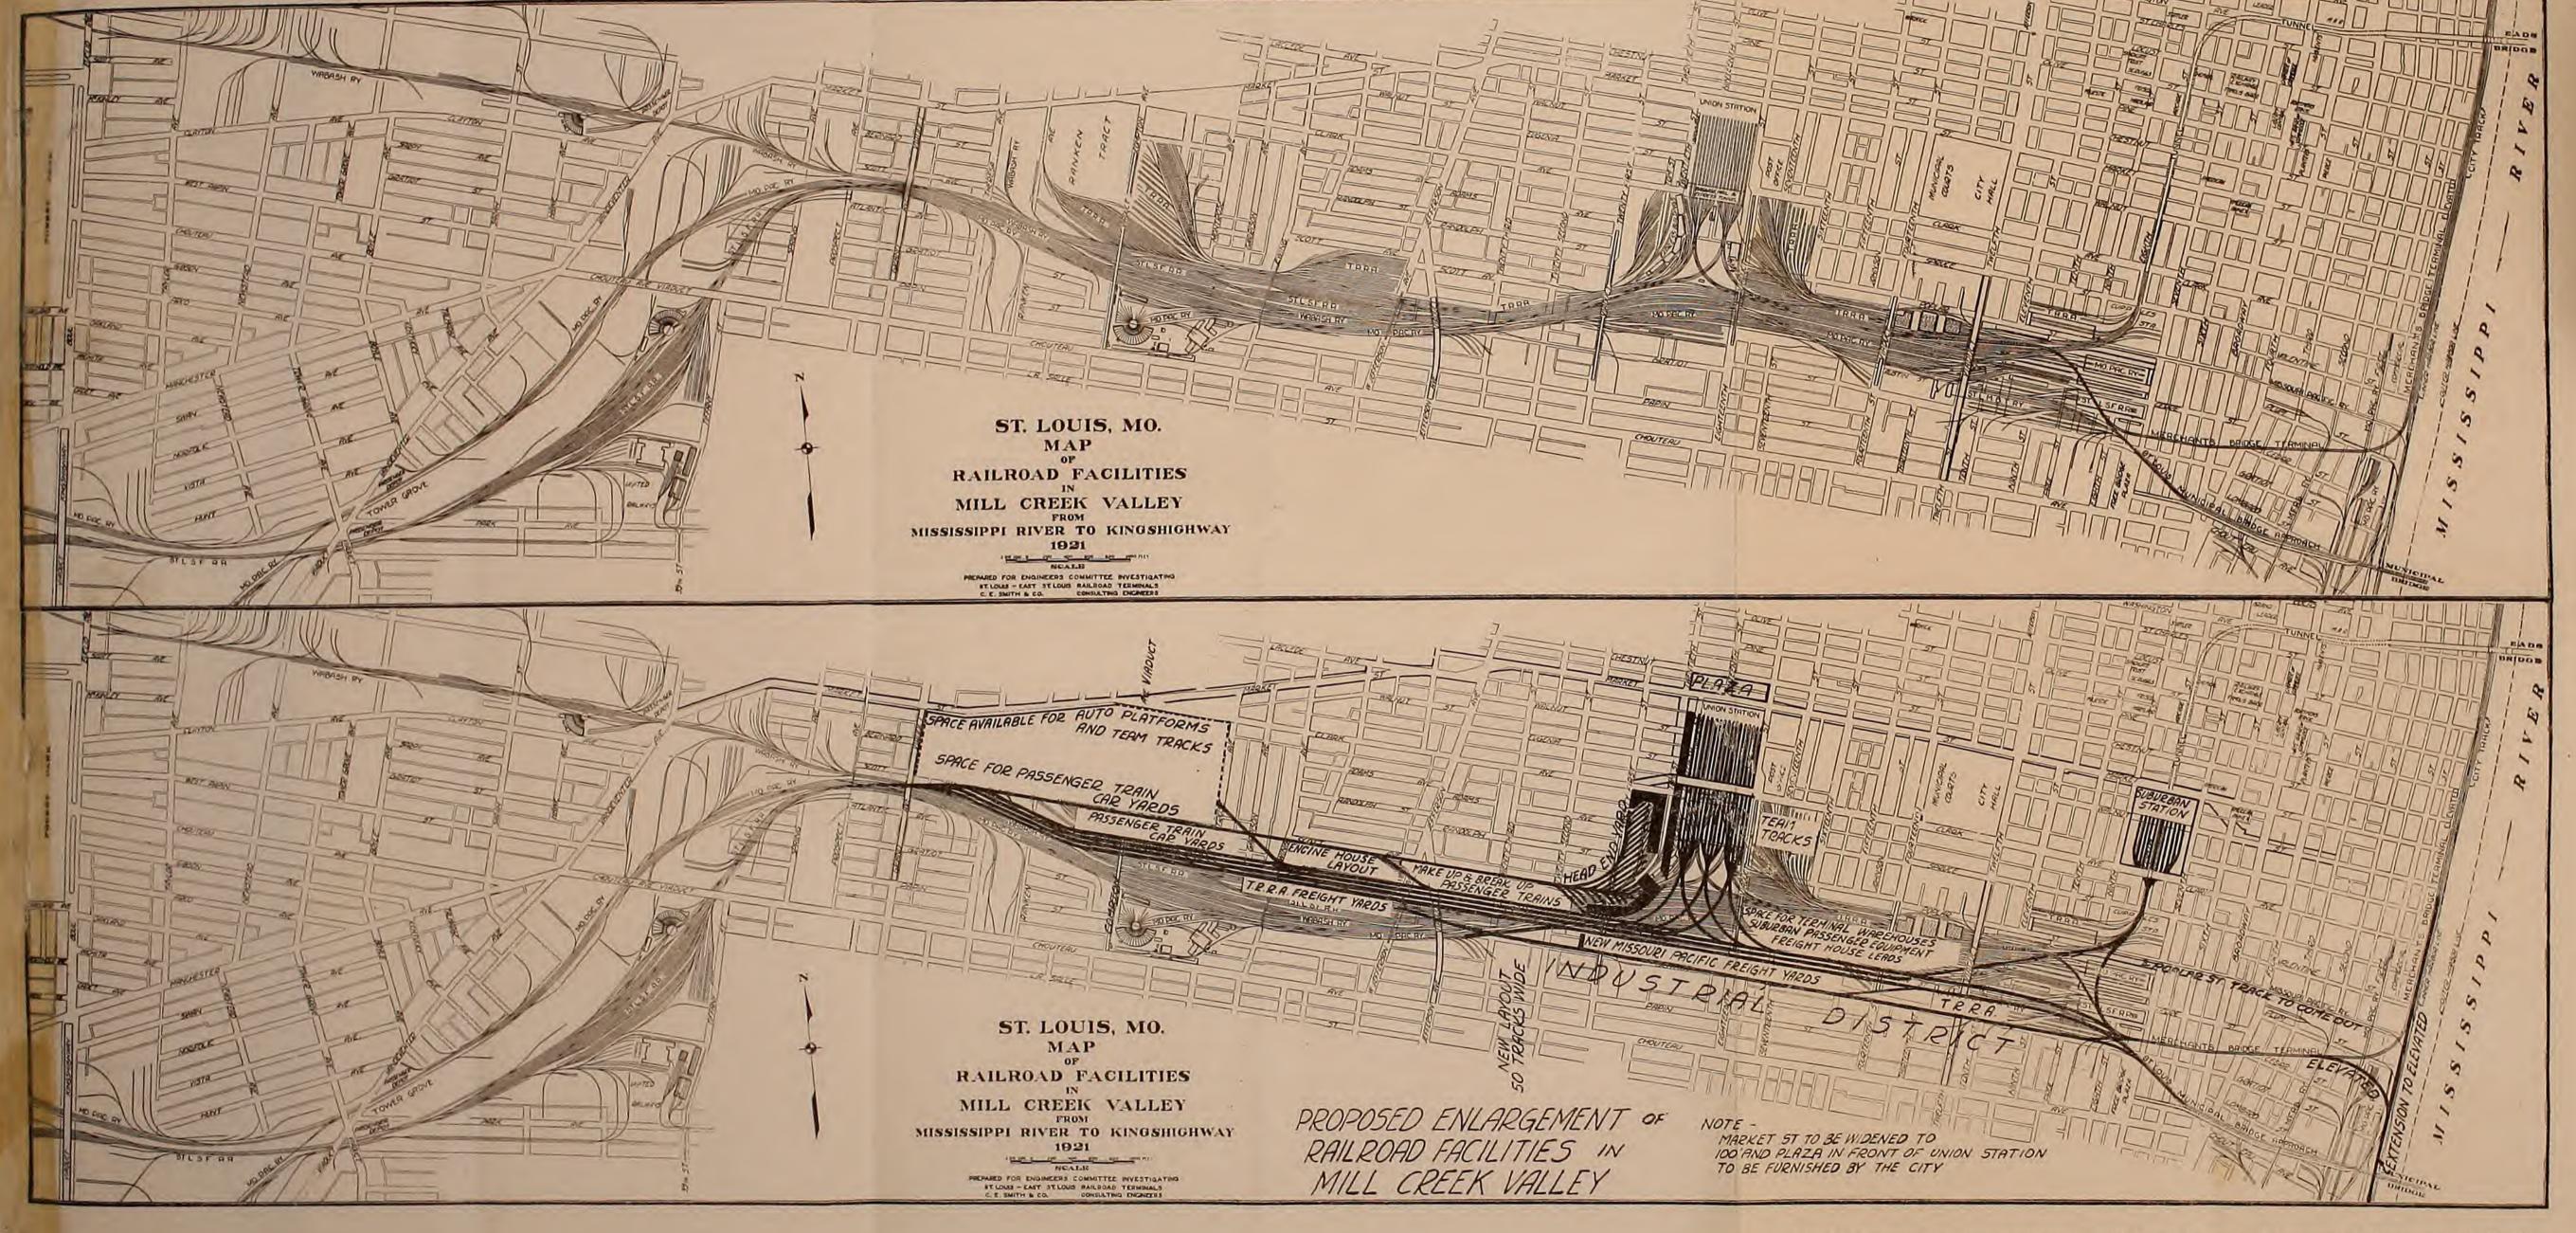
Present Railroad Facilities in Mill Creek Valley and Proposed Enlargement of Facilities.
